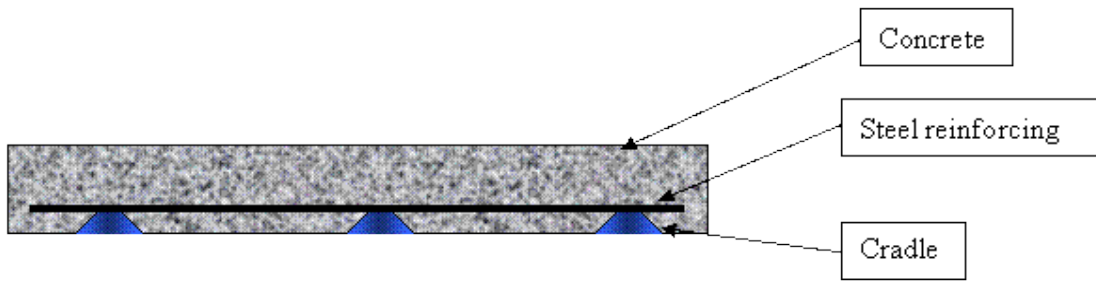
Typical of the reinforced concrete slab (NSW HSC nd)
